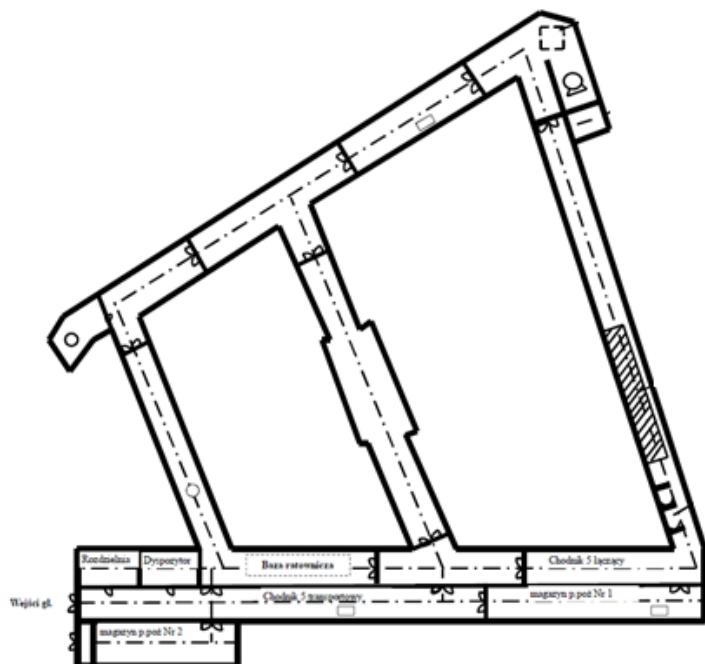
Draft of the practice mining excavation of the CSRG Bytom.
